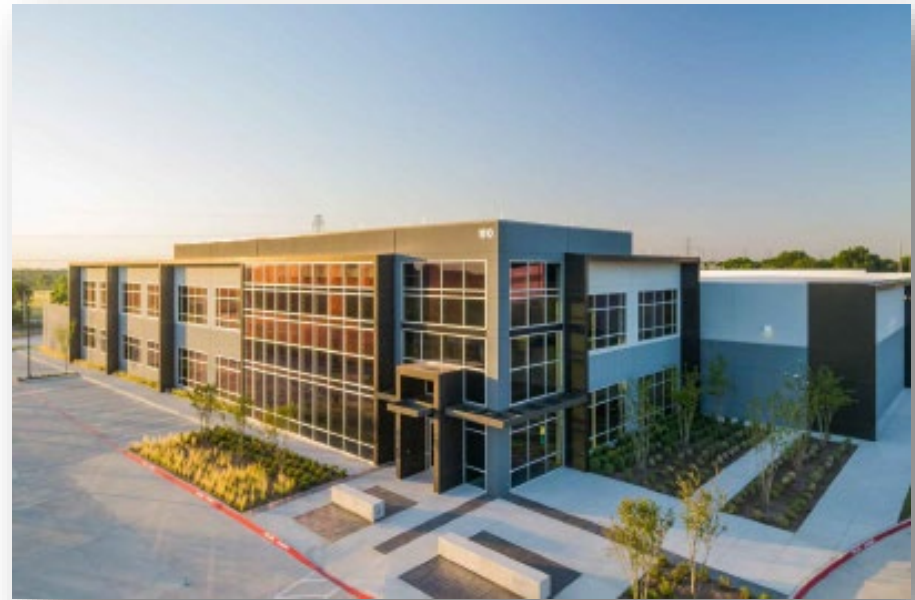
EXHIBIT B: DEVELOPMENT PLAN – RENDERINGS
